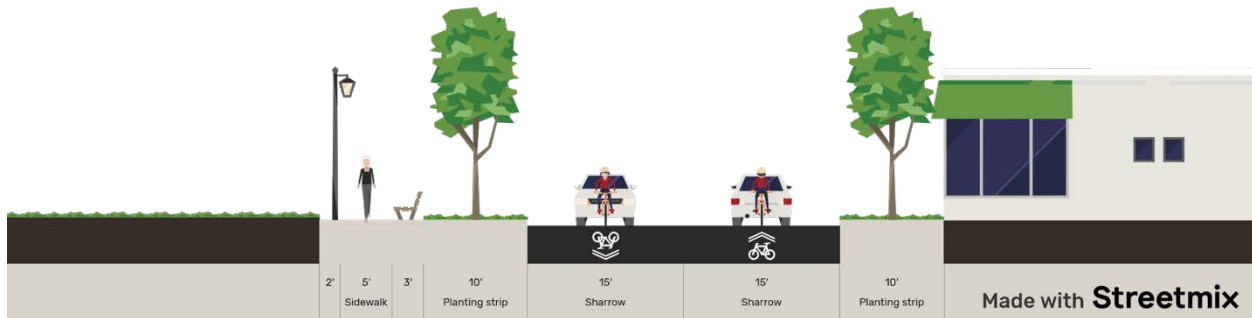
Proposed cross-section of West 46th Street looking east. This new design includes a shared bike lane. Bike sharrows will be added to the road. It also suggests restricting on-street parking; the drive lanes will become wider. The width of the furniture zone will be decreased so sidewalks can become wider. Diagram created in Streetmix by EC, 2022.
